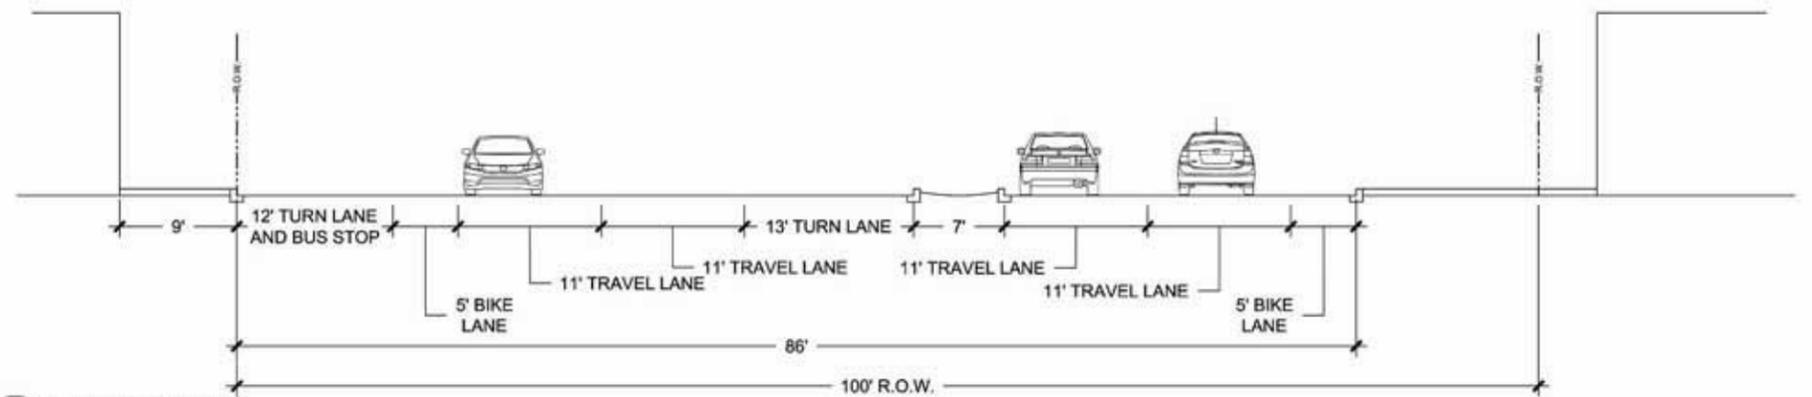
b: Rights-of-Way Cross-Sections
